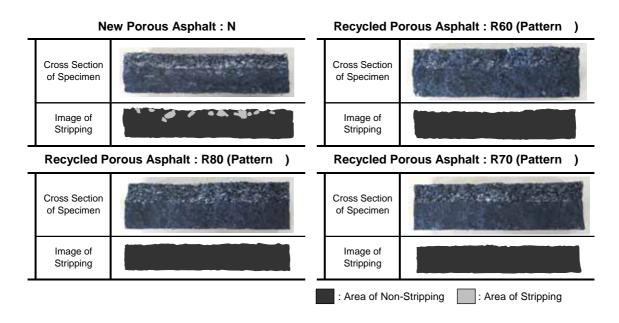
Cross section of binder mix after Immersion Test (Inner Pass)
